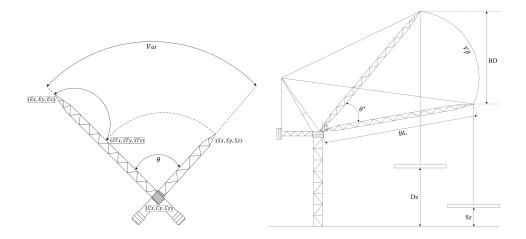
Loaded lifting in horizontal (left); and vertical planes (right)
